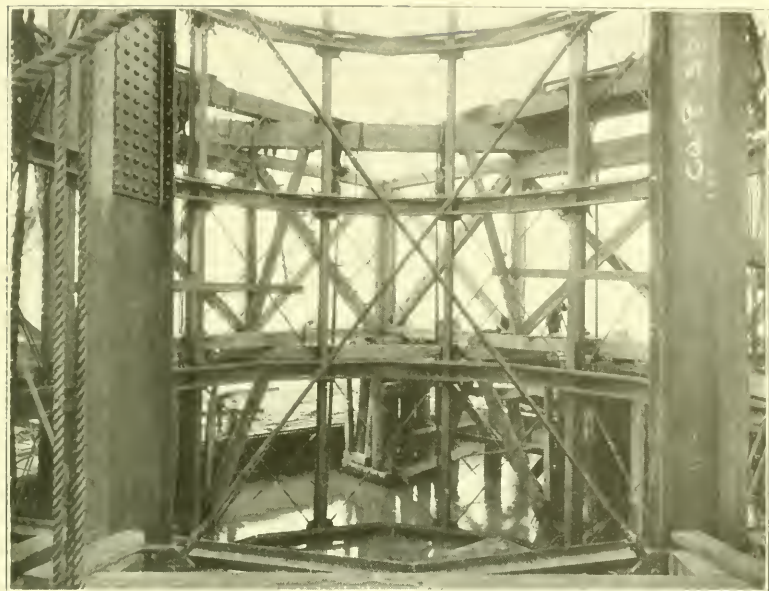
INTERIOR OF GUIDE-FRAME FOR PIVOT PIER CASING,
